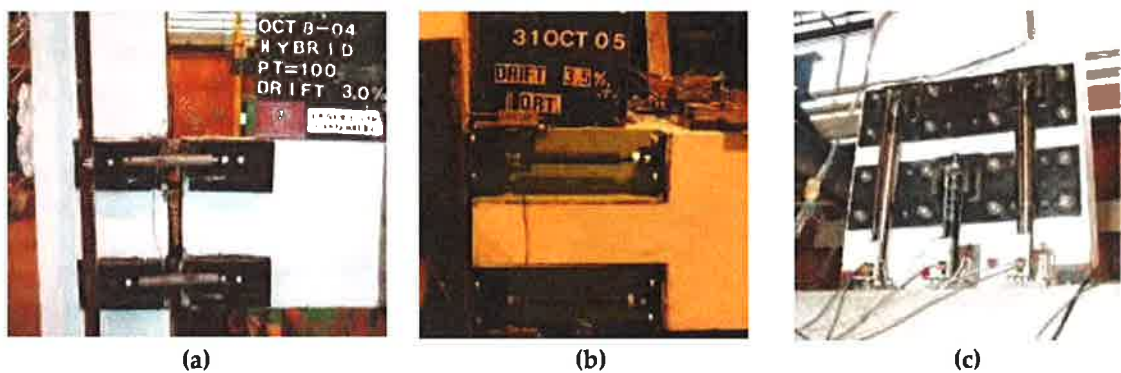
Alternative configurations of external dissipaters for hybrid systems: (a) and (b) beam-column connections, with recesses in the beam (from Pampanin et al., 2006); (c) wall to foundation connection (from Marriott et al., 200b).
